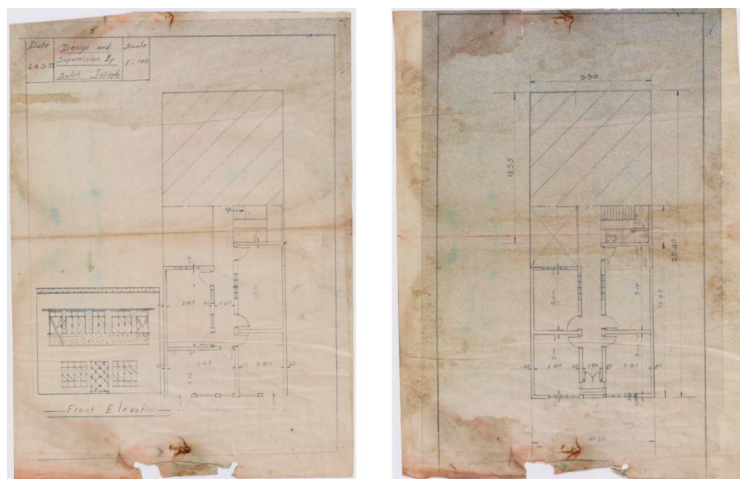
Front elevation, floor plan and material description for an addition to the Frank Iny School, by Ir. Saleh Youssef, 24 May 1957 (Source: Iraqi Jewish Archive).
